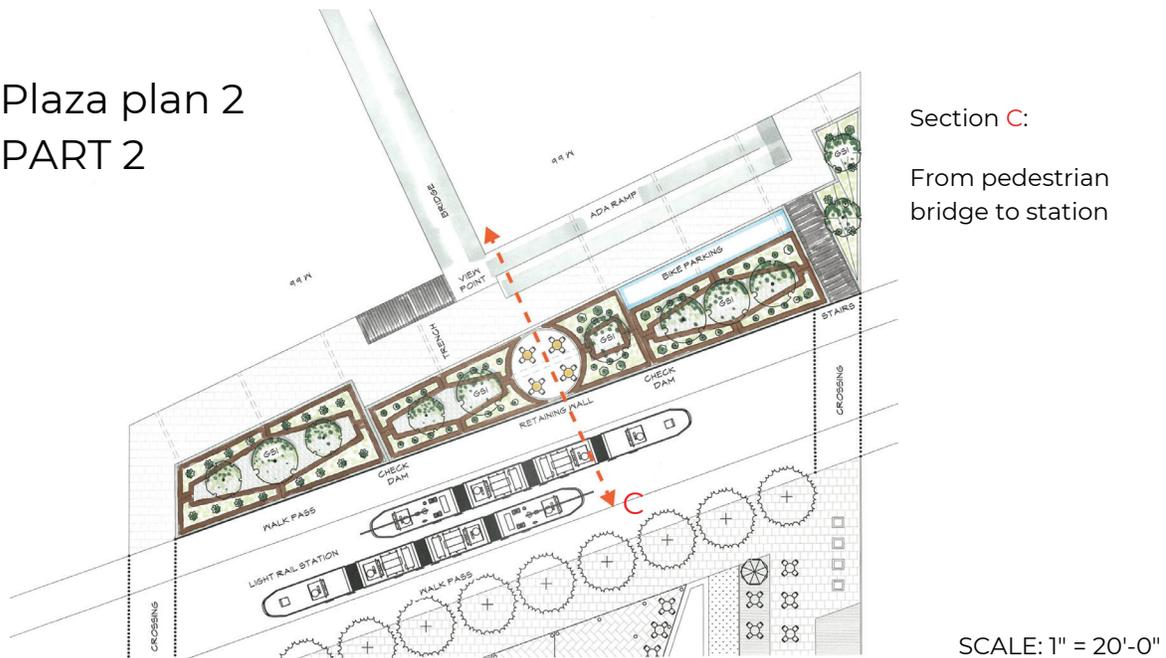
Northern half of the site plan detailing the pedestrian bridge to the station.
